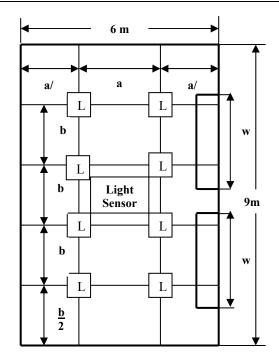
Layout of LED panels and Light Sensor on Ceiling
